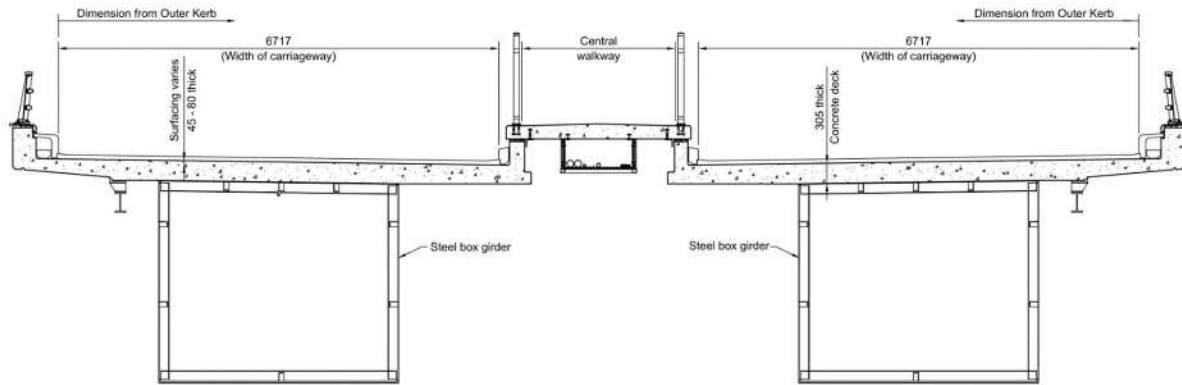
Existing Tay Road Bridge Typical Cross Section
